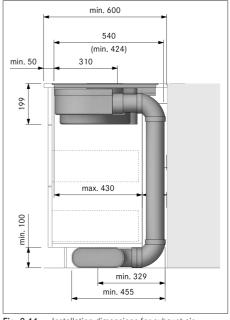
Installation dimensions for exhaust air, worktop depth 600 mm
